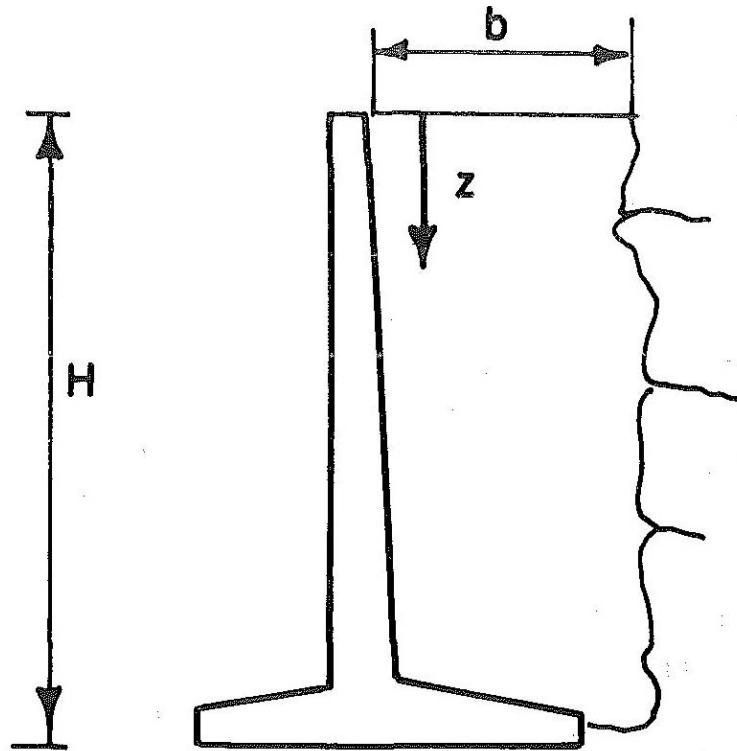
Schematic Representation of Retaining Wall near Rock Face
